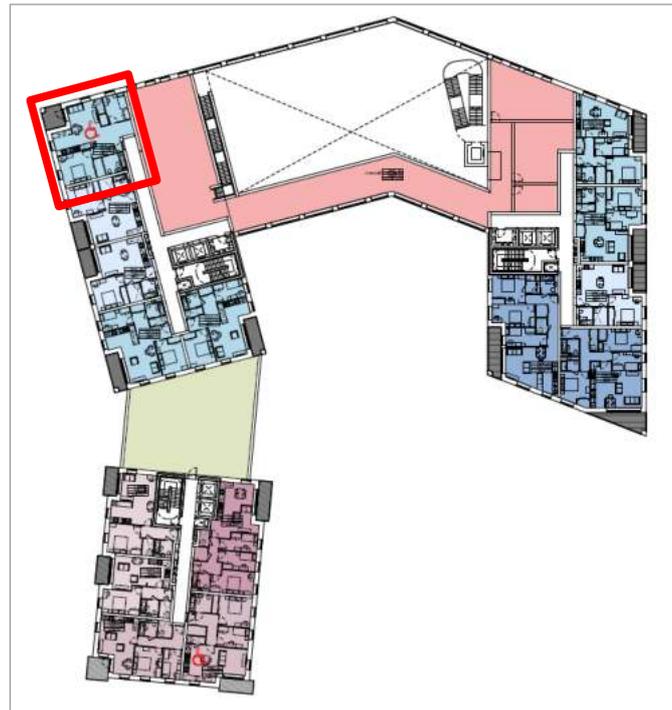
Block C, 1st floor selected 2bed dwelling on the nosy façade (Patel Taylor drawings 21.09.2020).
